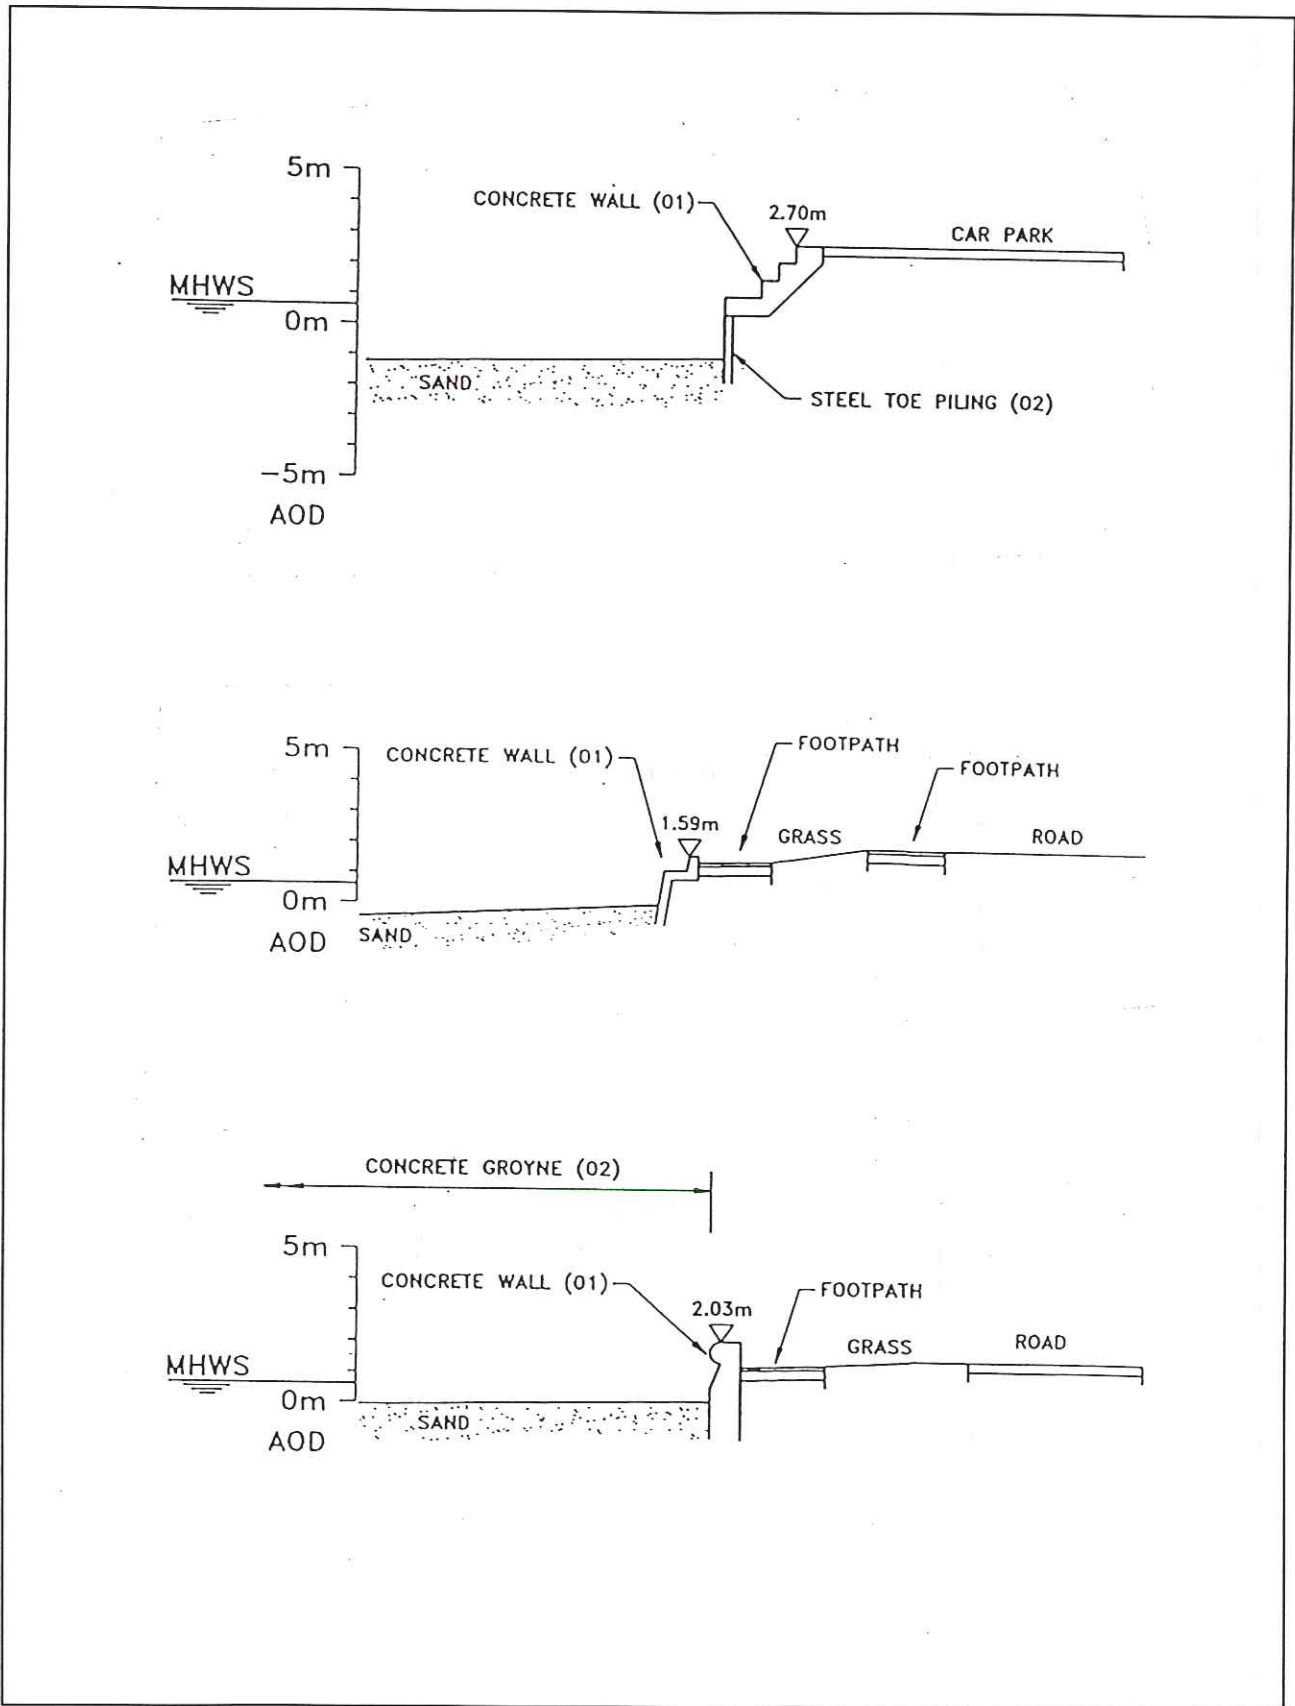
Seawall cross-sections 3/3, 4/2 and 4/5
